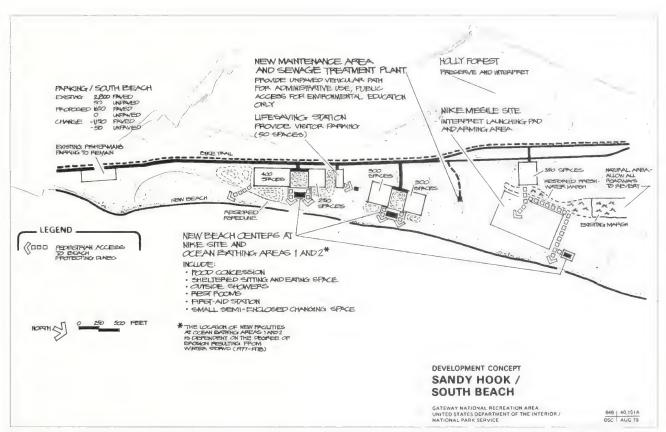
Development Concept Sandy Hook / South Beach. Completed in 1979, the Gateway National Recreational Area General Management Plan proposed a 350-car parking area at the former NIKE launch site for visitation and access to a proposed, small beach center located off the site's northeast corner. In the years following the General Management Plan, neither the beach center nor the parking area was developed in this area (General Management Plan: Gateway National Recreation Area—New York/New Jersey, United States Department of the Interior, National Park Service, 1979).
